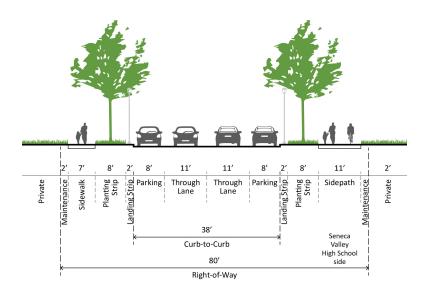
Proposed Typical Street Section for Crystal Rock Drive
